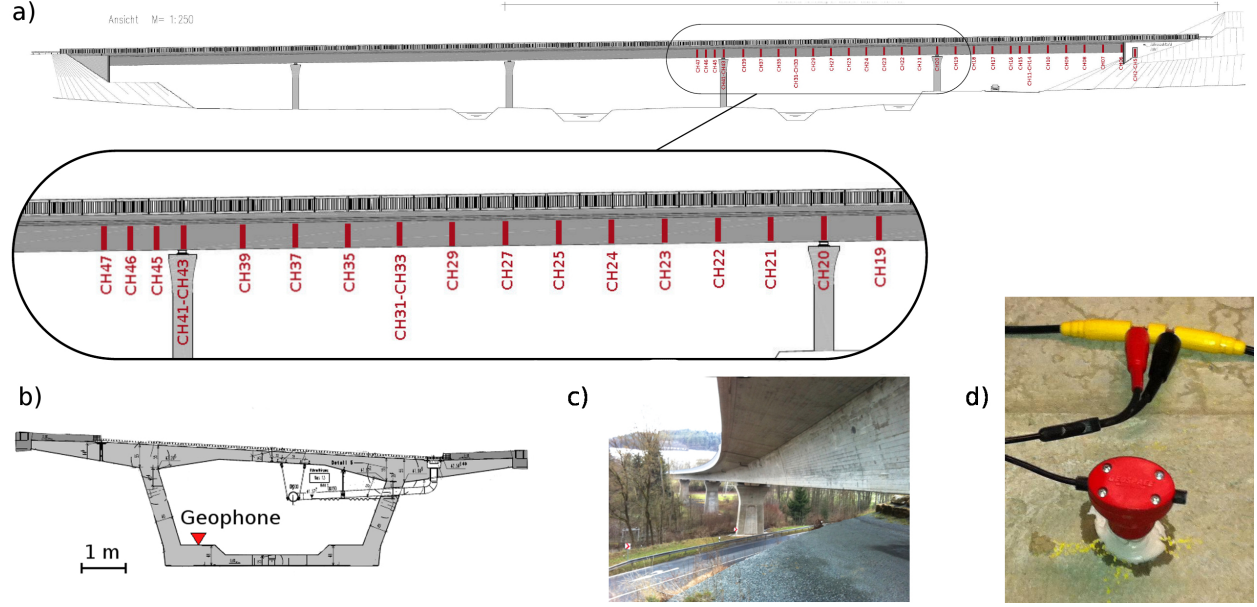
(a) Lateral view on the Steinachtal bridge (scheme). Bars indicate the positions of geophones in the box girder. (b) Cross-section of the box girder with geophone position indicated by a triangle. (c) The photo shows the bridge in construction state, viewed from below. (d) Fixing of a geophone to the bridge. The instrument was screwed on a footplate, which was then cemented on bridge. It was not possible to drill holes into the bridge itself.
